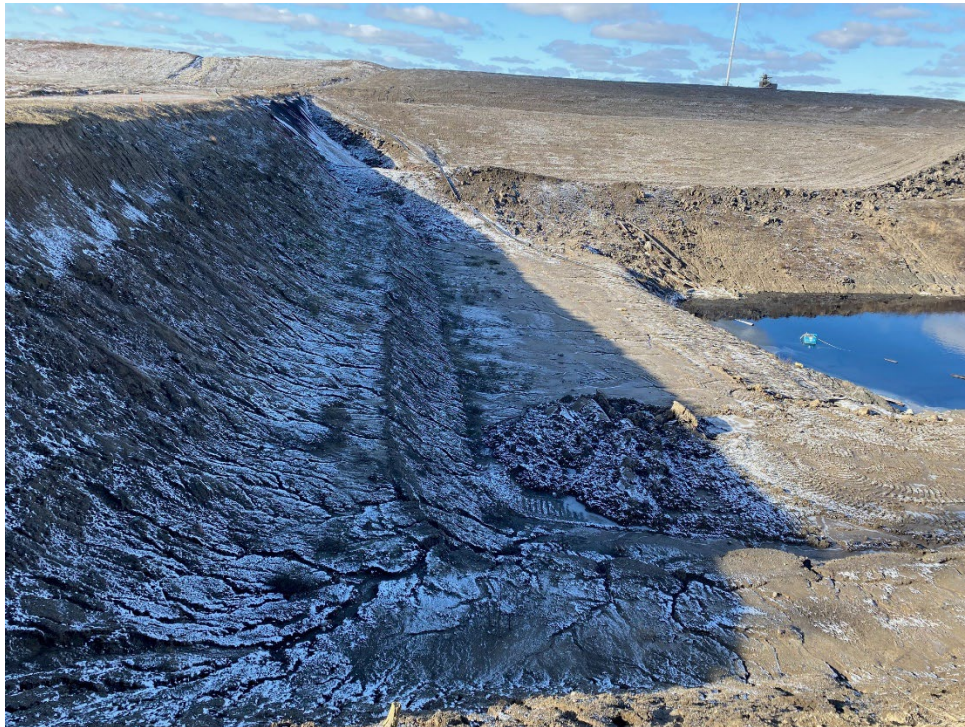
Cell 20-1 Southeast corner south side wall, looking west. Some sloughing and seepage from the southeast corner, December 19, 2023
